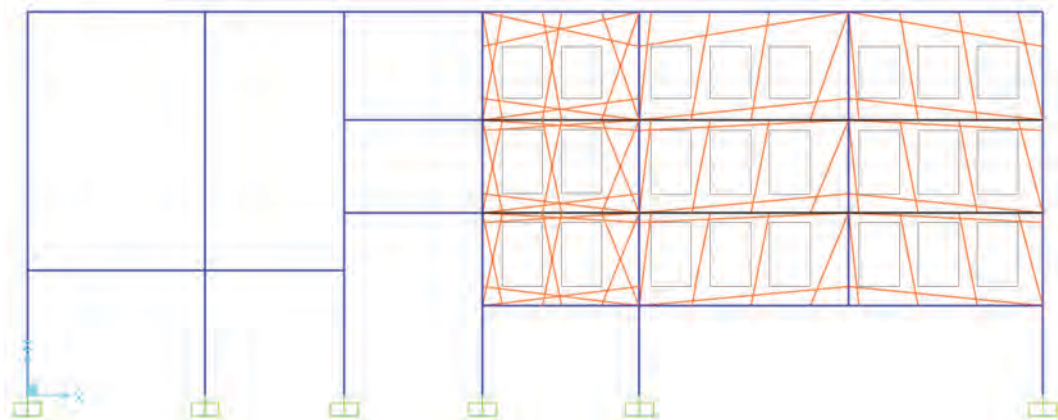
Haskett House frame structure with compressive strut elements for representing infill walls.
